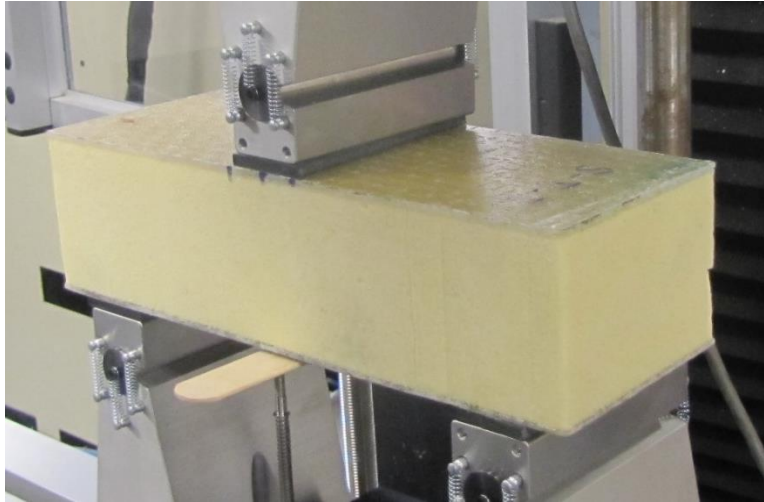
Type 1 (PU RIGID) Sandwich Panel Specimen
